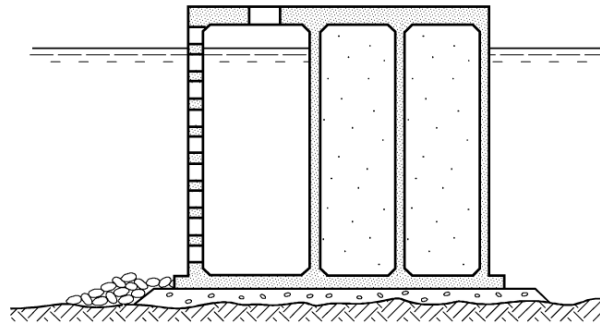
Perforated front wall caisson breakwater. CEM [2012]
